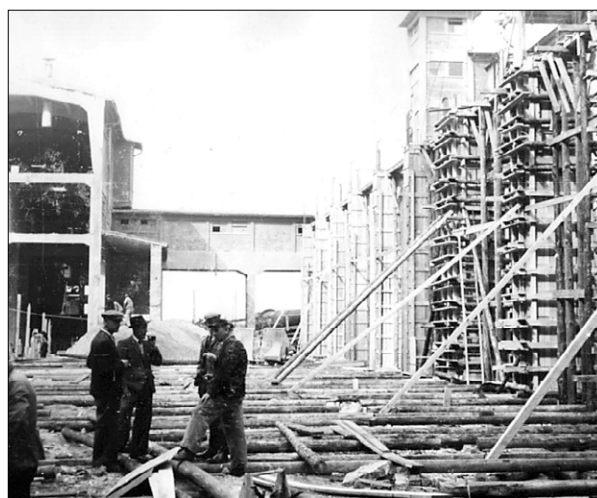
Reconstruction of the cement factory after the Second World War; photo [in:] Archives of the Odra Cement Factory, s.v.
